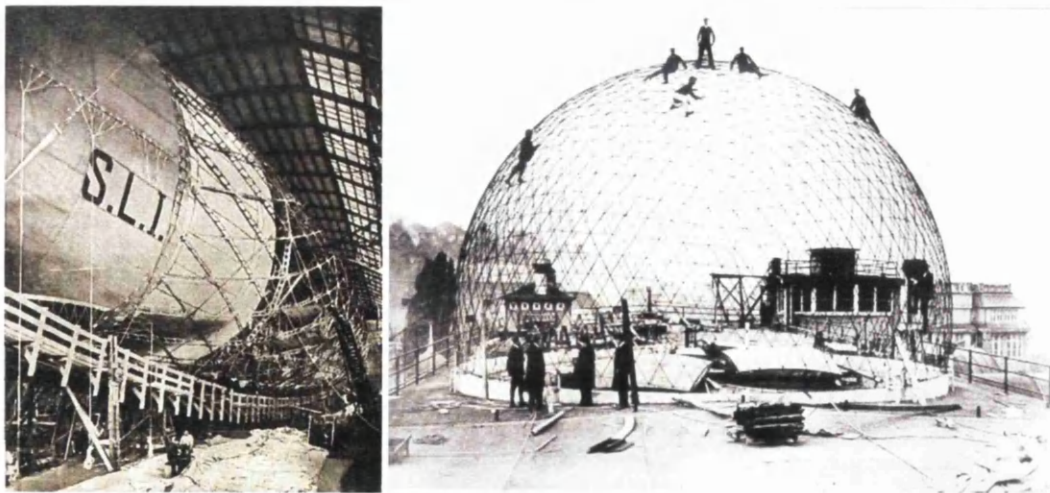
Schütte-Lanz SL1 rigid airship under construction, 1911 (left) (SL1 Wooden Lattice framework n.d.). Construction of the Carl Zeiss geodesic dome in Jena (Germany) 1922 (right) (Bauersfeld-Zeis-Jena n.d.).
